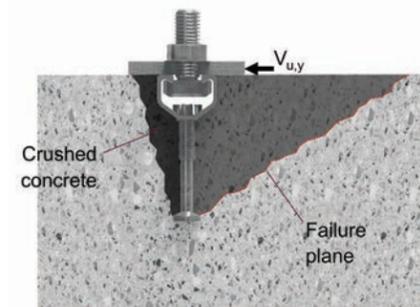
Load-bearing mechanism of headed stud anchorage subjected to shear loading (schematic).
